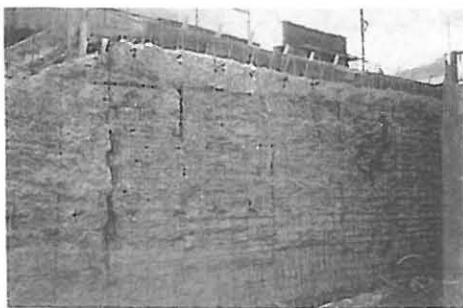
Placement of epoxy coated reinforcing steel in retaining wall. At this stage the outer 300 mm of deteriorated concrete has been removed and the mechanical anchors and form ties have been installed.
